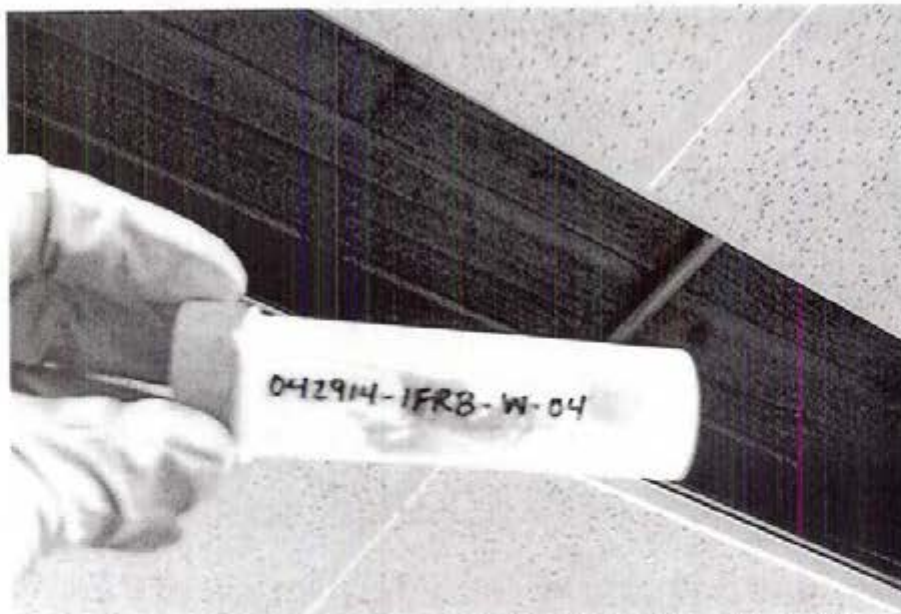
Lead wipe sample (042914-IFRB-W-04) collected from old wood paneling above the drop ceiling; east end of hallway.
